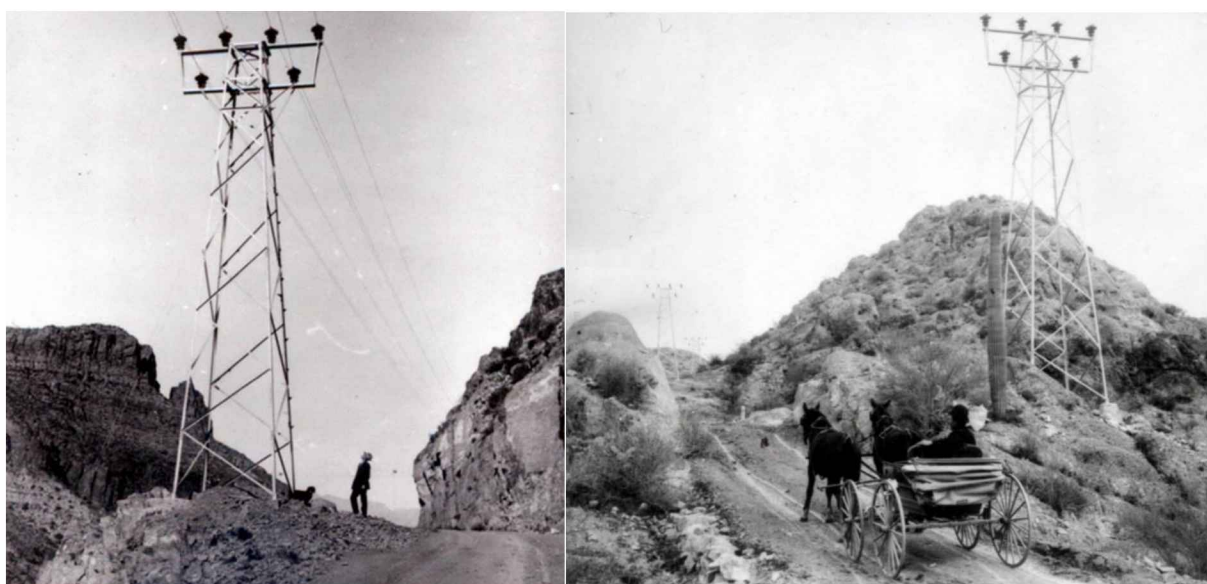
Existing Lattice Tower in Rough Terrain (Original Construction Photos).
